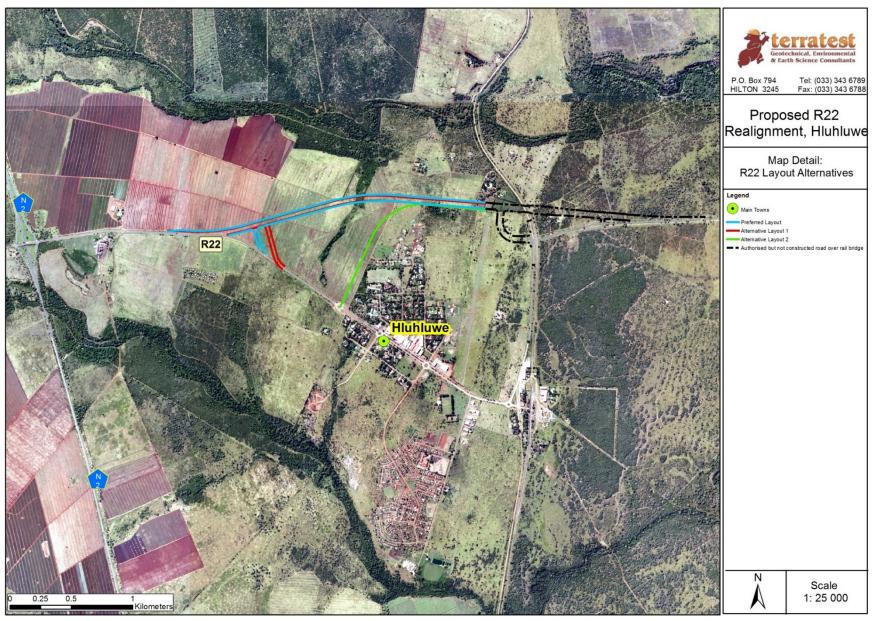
Proposed Layout Alternatives and their tie in to the authorised but not constructed road-over-rail bridge.
